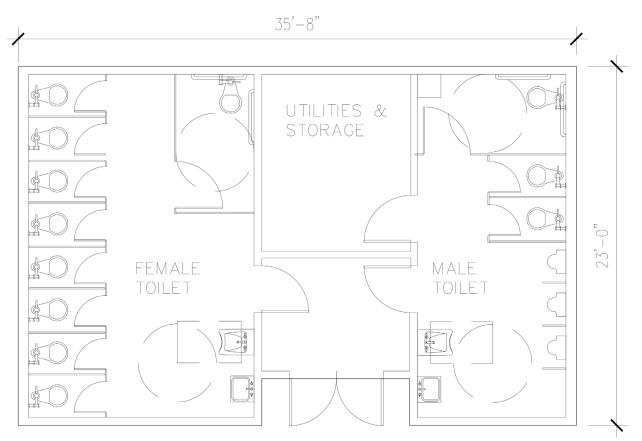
Conceptual Bathroom Building Layout Plan (828 square feet)
